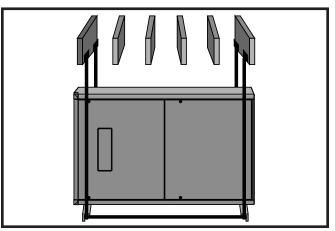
SA Horizontal Installation Suspended in Attic or Crawl Space
